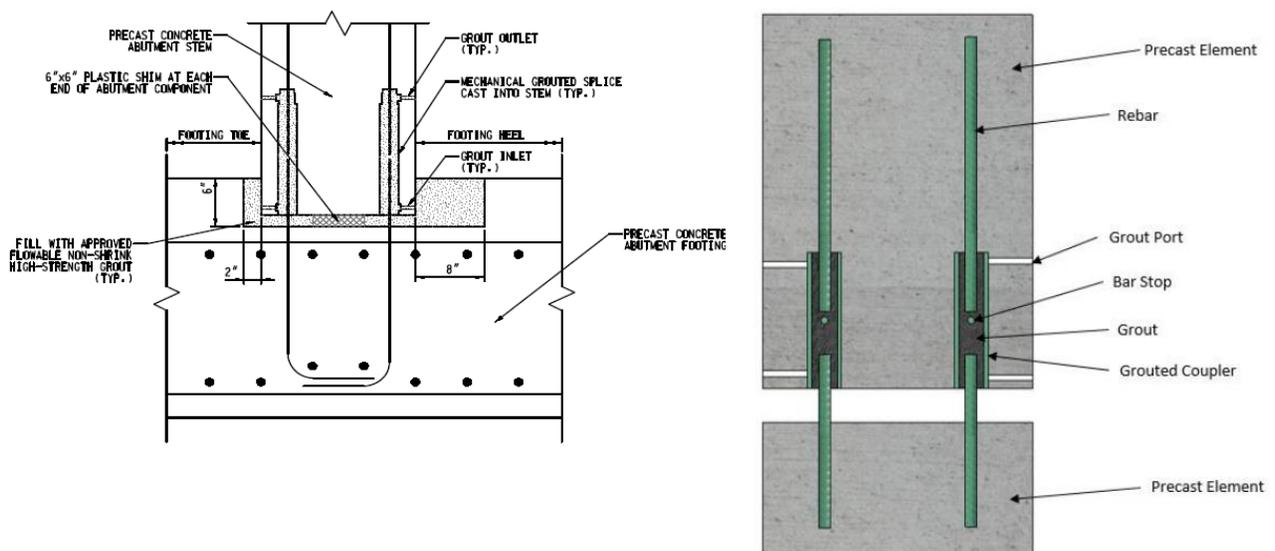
Precast abutment stem to precast footing connection [2, 42]
